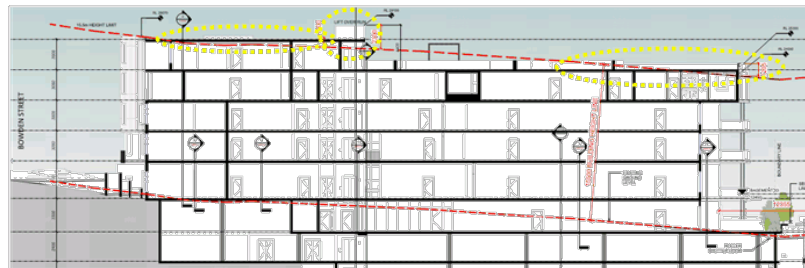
Section of proposal with height breaches outlined yellow (Source: Robertson + Marks)
